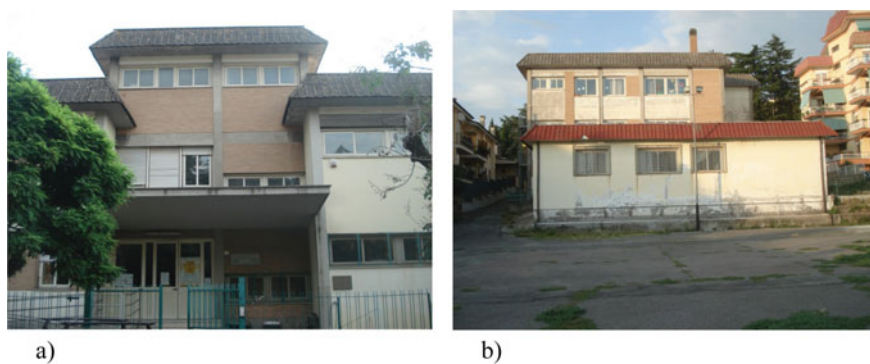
a Front elevation and b rear elevation of the building
